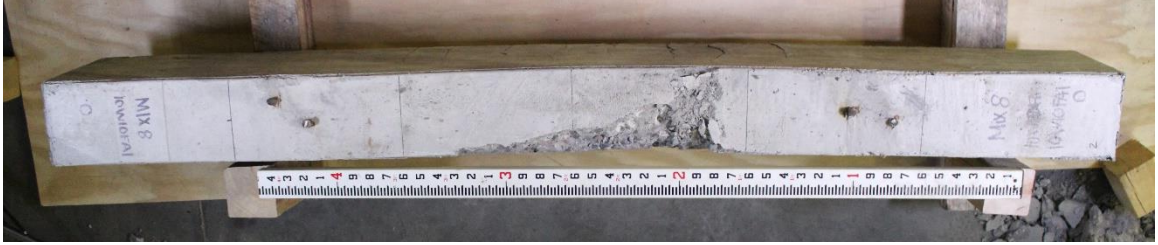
Mixture 8 (10W10FA1) beam #20: concrete beam top view.
